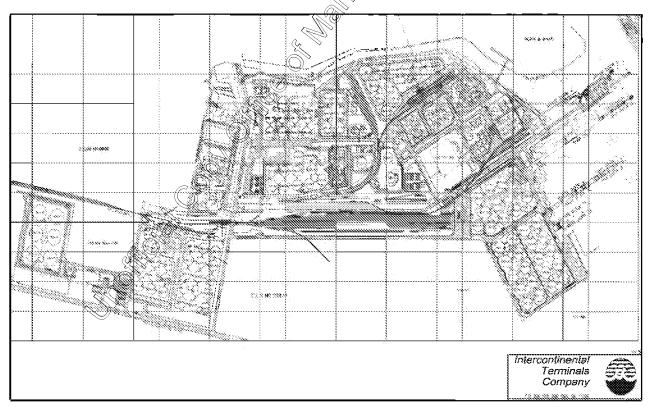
ITC Deer Park Terminal Overall Plot Plan. (Source: ITC).
